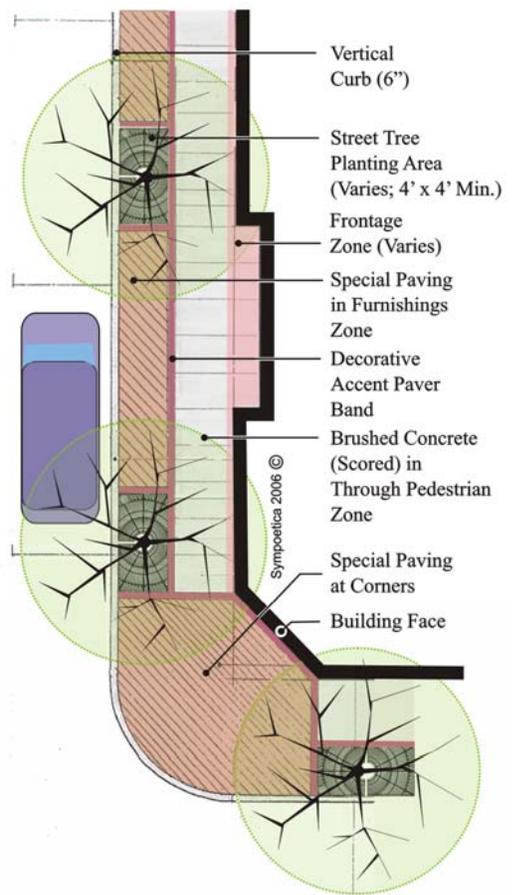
Illustrative Streetscape Treatment Prototype Plan
